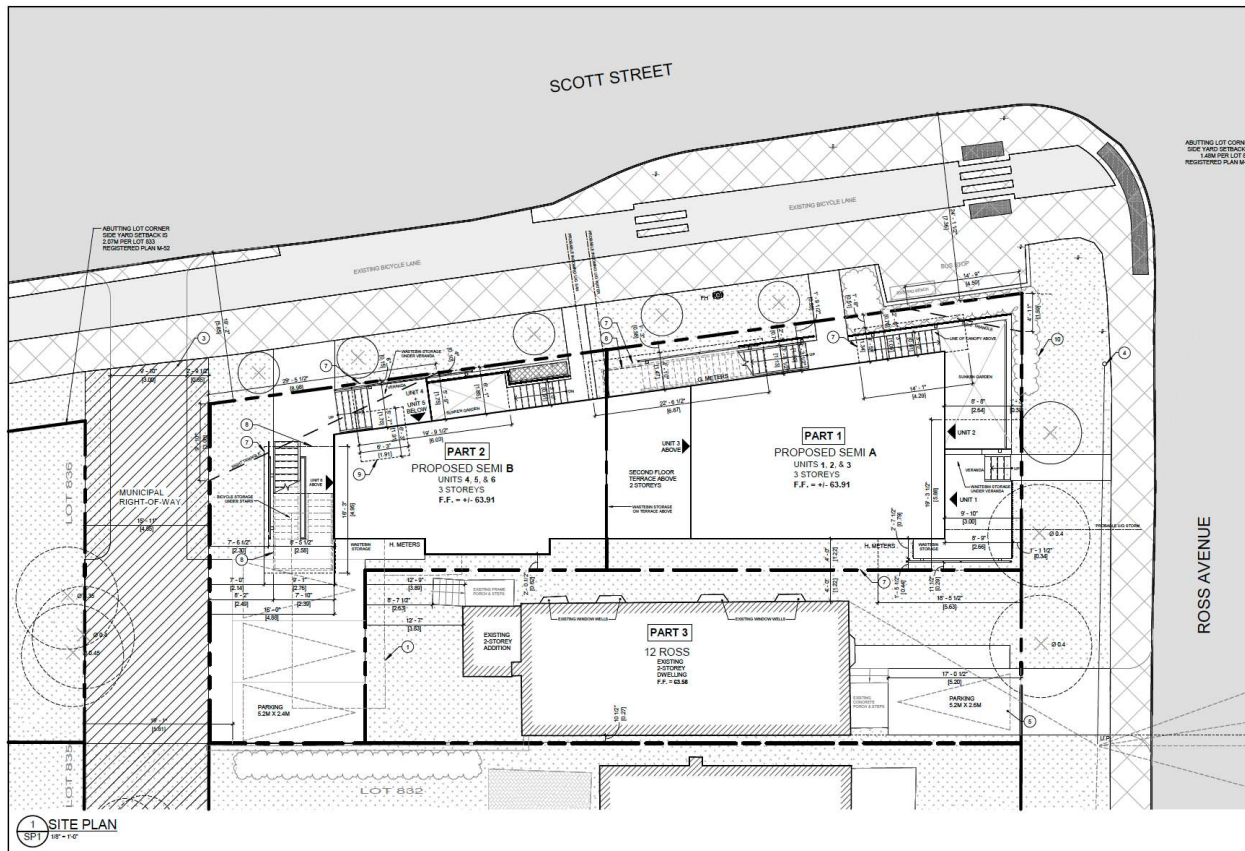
Site Plan (Source: Colizza Bruni Architecture)
